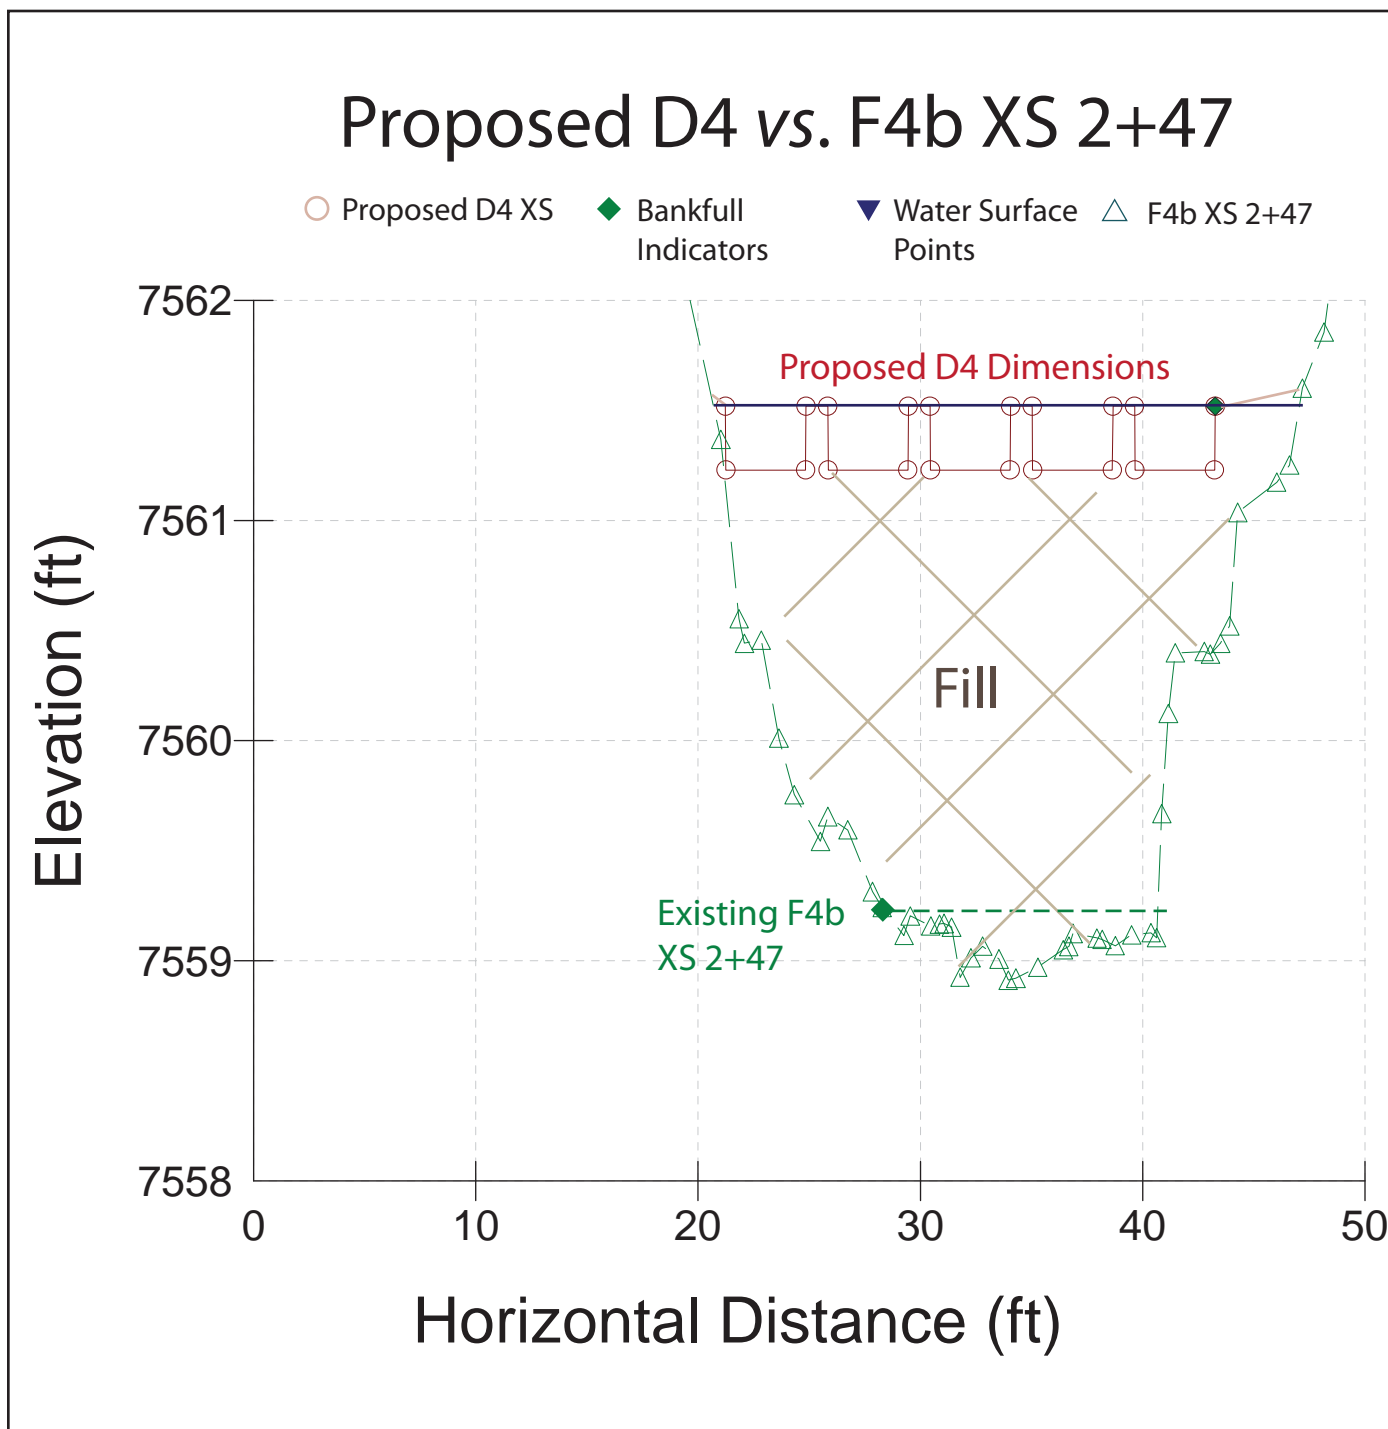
The typical, proposed D4 cross-section dimensions compared to the existing F4b cross-section 2+47, indicating the extensive fill requirements and new bankfull elevation.
